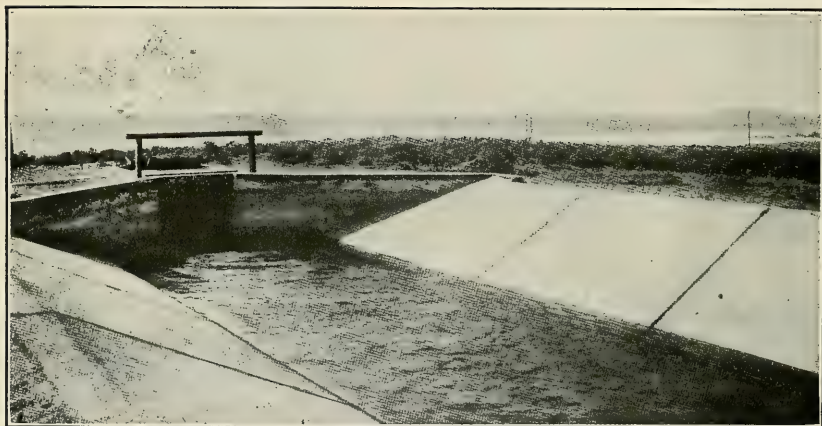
OUTLET STRUCTURE, PUMPING LINE OF PASCO RECLAMATION CO., WASHINGTON. (No. 33.) Discharge measured by rod floats in this concrete section.
